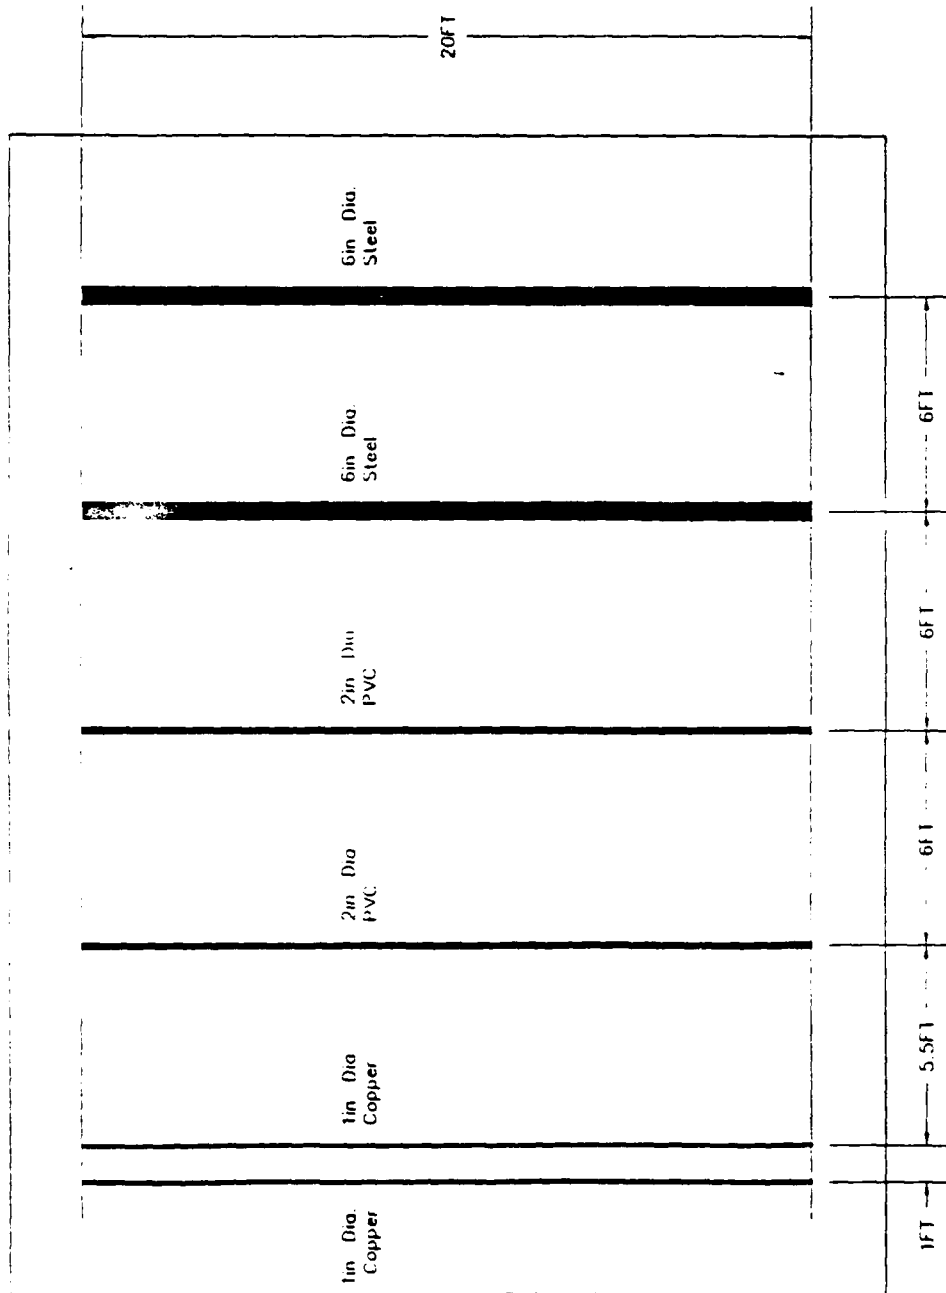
Top view drawing of pipe test field showing pipe sizes and locations.
